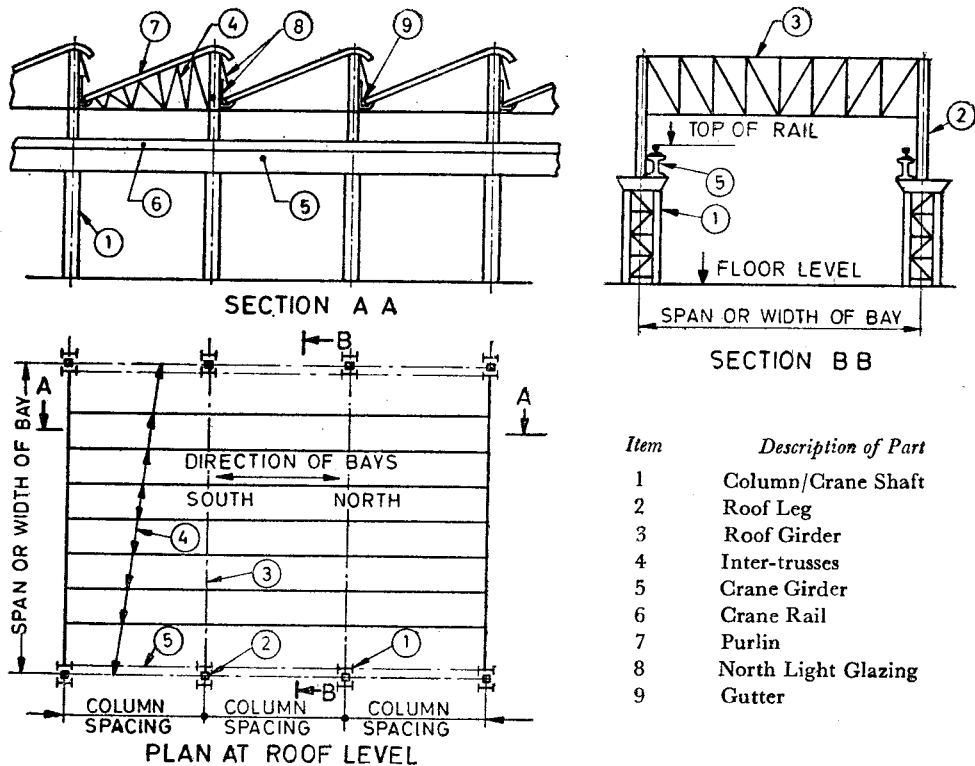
TYPICAL FACTORY BUILDING — DIRECTION OF BAY, NORTH-SOUTH
